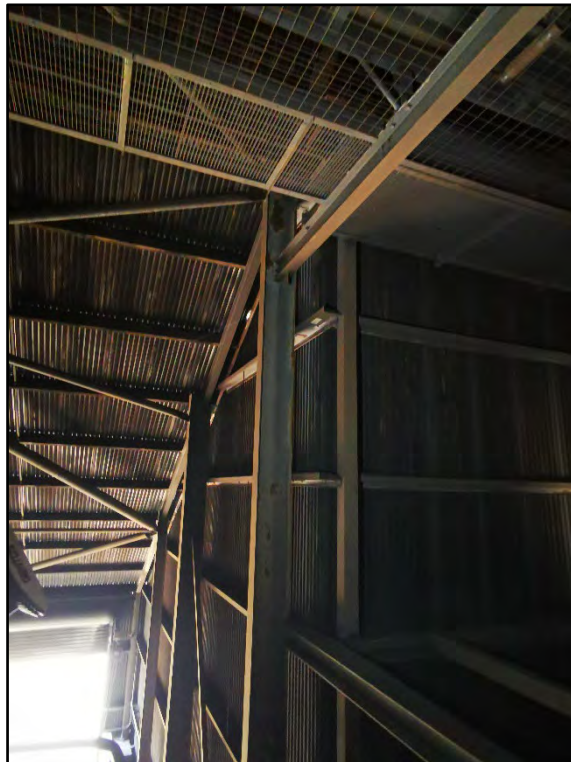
Surface Corrosion of Bolts, Rafter and Purlin Due to Product Deposit
